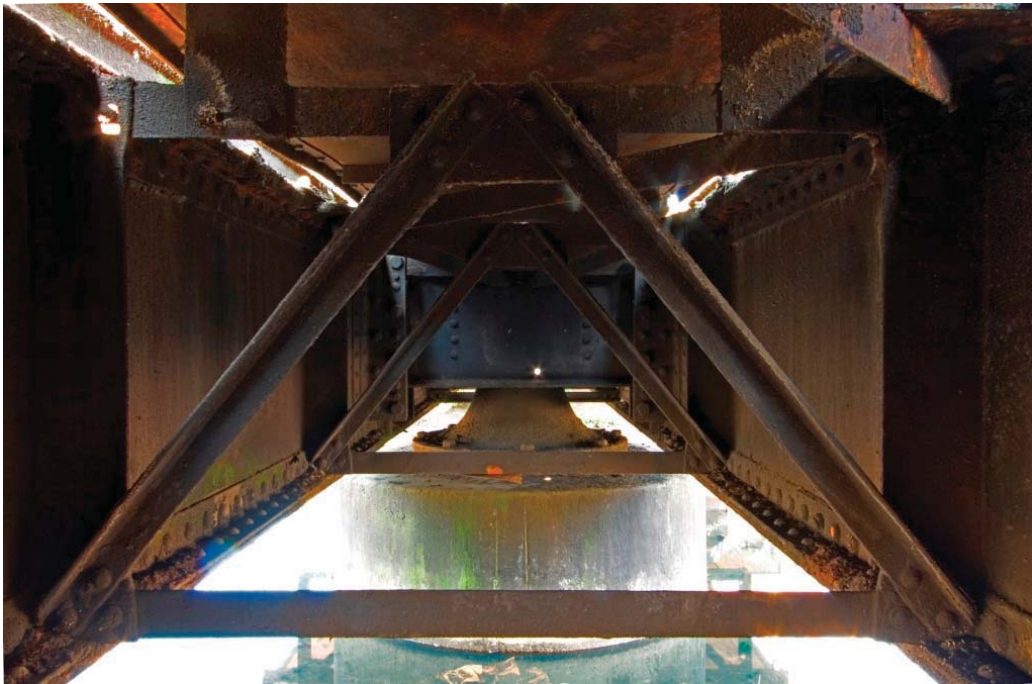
Underside of turntable between main beams showing horizontal and diagonal bracing and central pivot.
